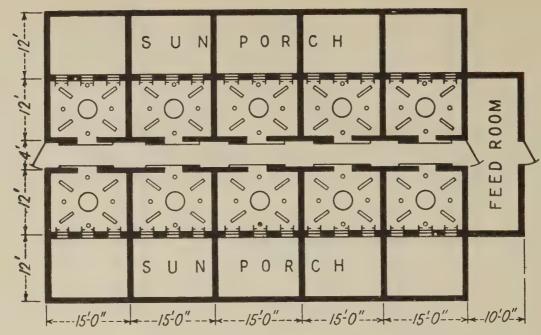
A floor plan of the multiple-type house with two rows of pens. Each unit is equipped with stove, fountains, and feeders. Slide doors permit access to the different pens. The feed room should be put on the north end, or in the center when the house is exceptionally long. (W. R. Whitfield, H. L. Wilcke, and W. M. Vernon, Iowa Extension Service.)
